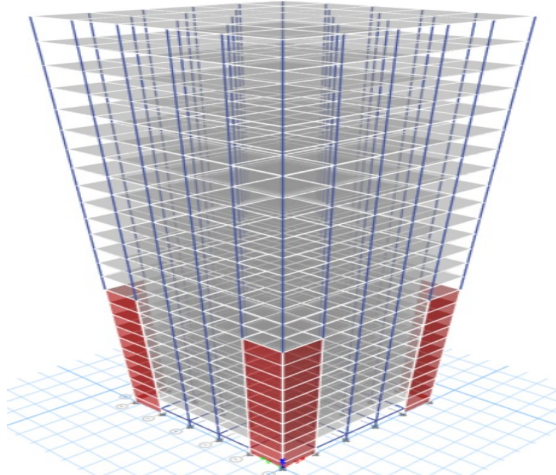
D View of RC framed structure with shear wall (From base to 10th story)
